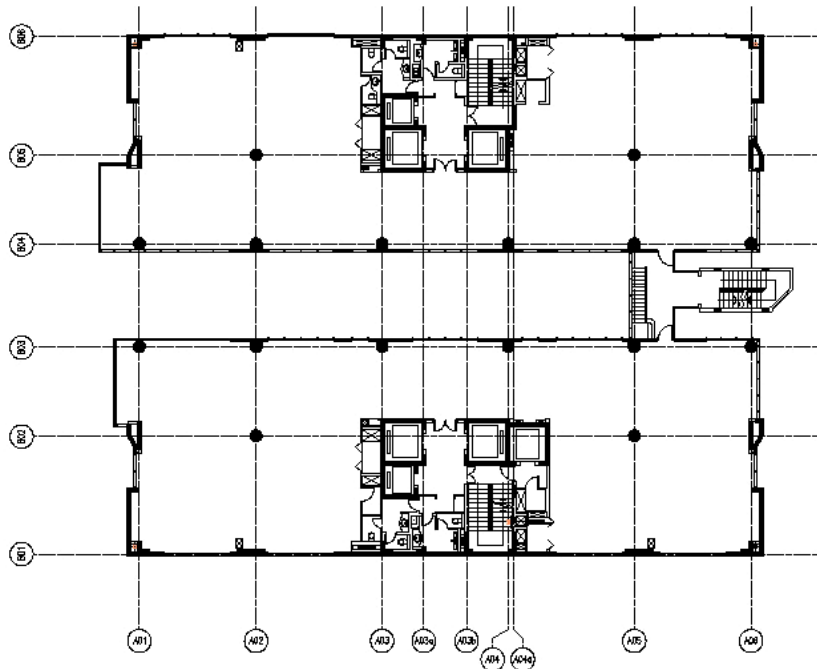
Birla Corporate Office, New Delhi: Fourth Floor Plan
